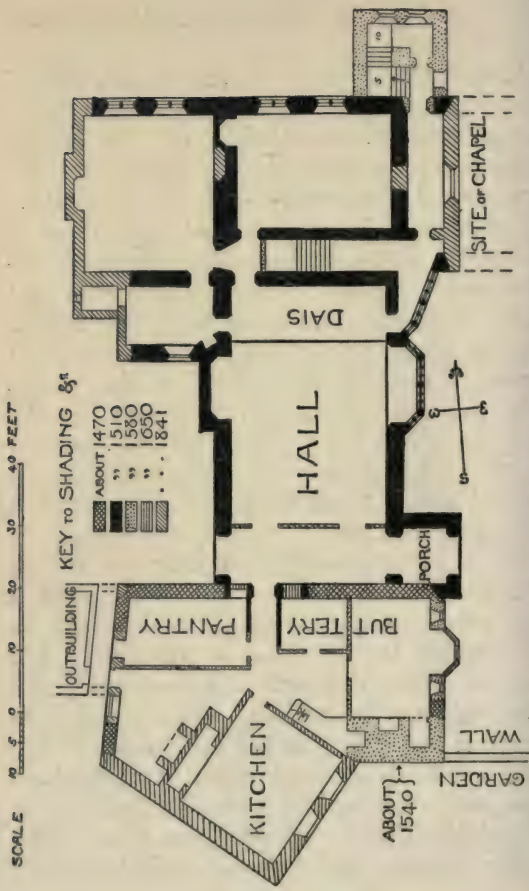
A TYPICAL MEDIEVAL PLAN, HORHAM HALL
